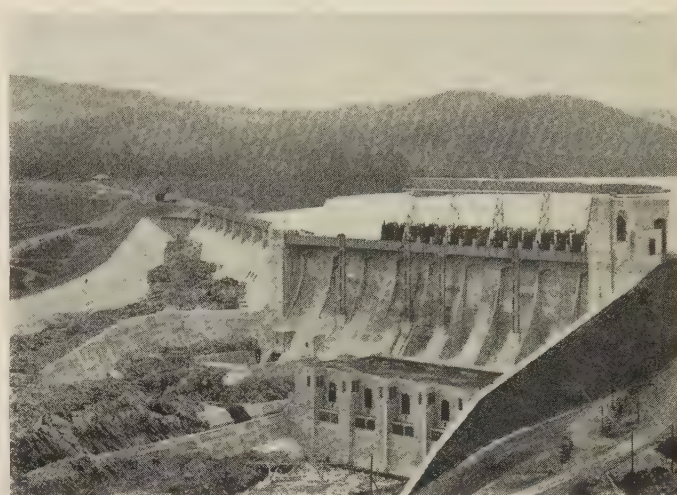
Fifteen Mile Falls plant on the Connecticut River, a typical low-head storage plant
